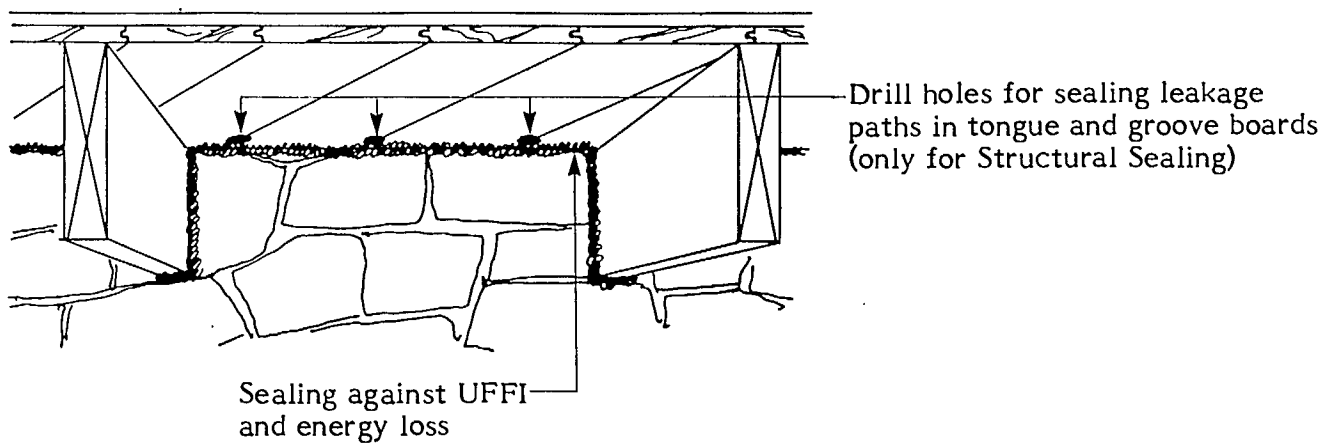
BOARD SUBFLOOR (Joists Set Into Foundation)
